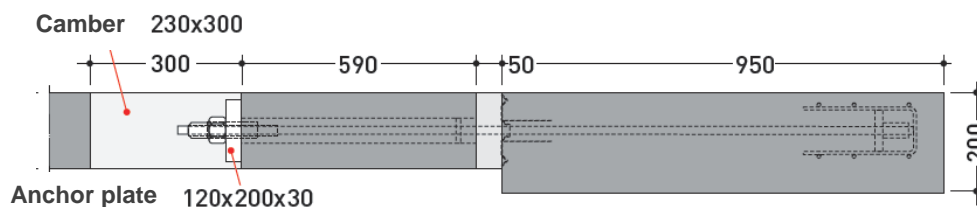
Principle of Norm-teq Heli-system; vertical section of fixation of façade element
